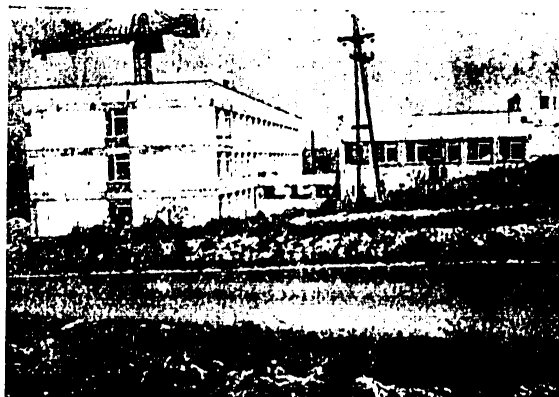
Study-laboratory building under construction at the Guinean Study Site.
